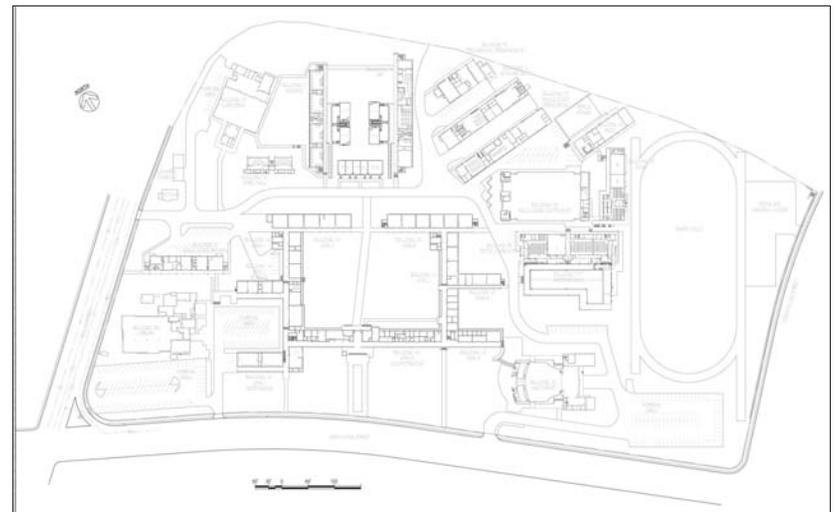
Plan view of Farrington High School buildings and schoolyard (map courtesy of Farrington High School)
